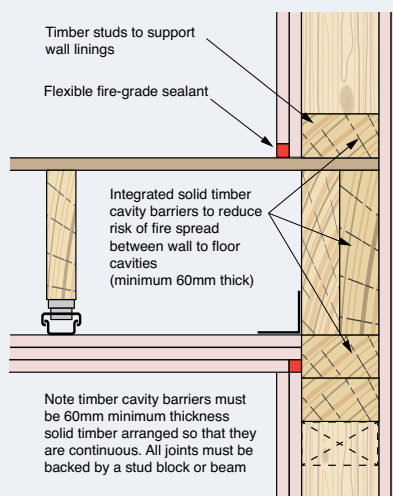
FRL 120/120/120 Fire-protected single stud timber frame wall /floor junction with integral cavity barriers – beams parallel to wall
